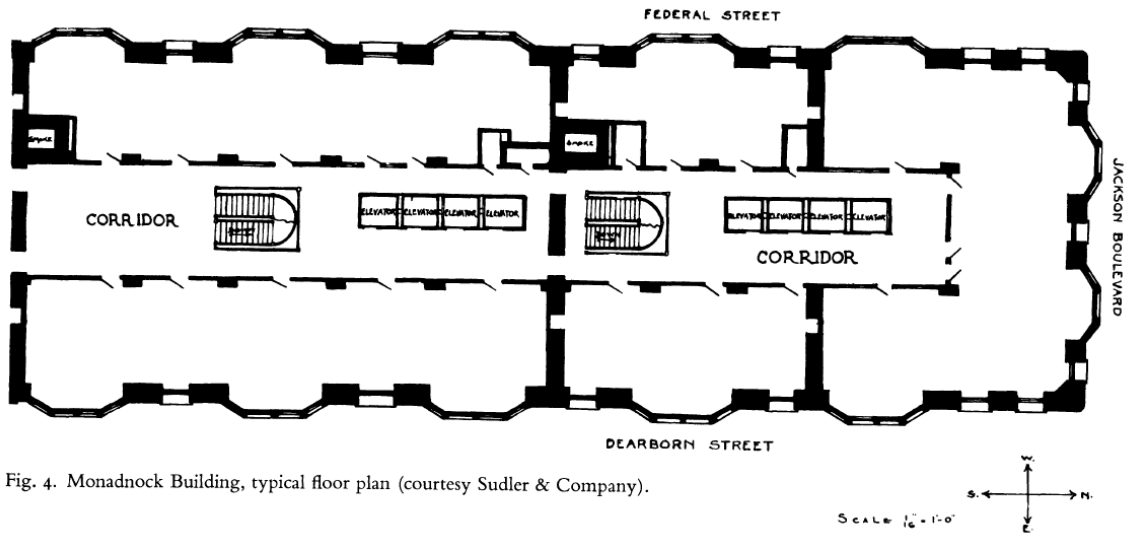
Monadnock Building, typical floor plan (courtesy Sudler & Company).
